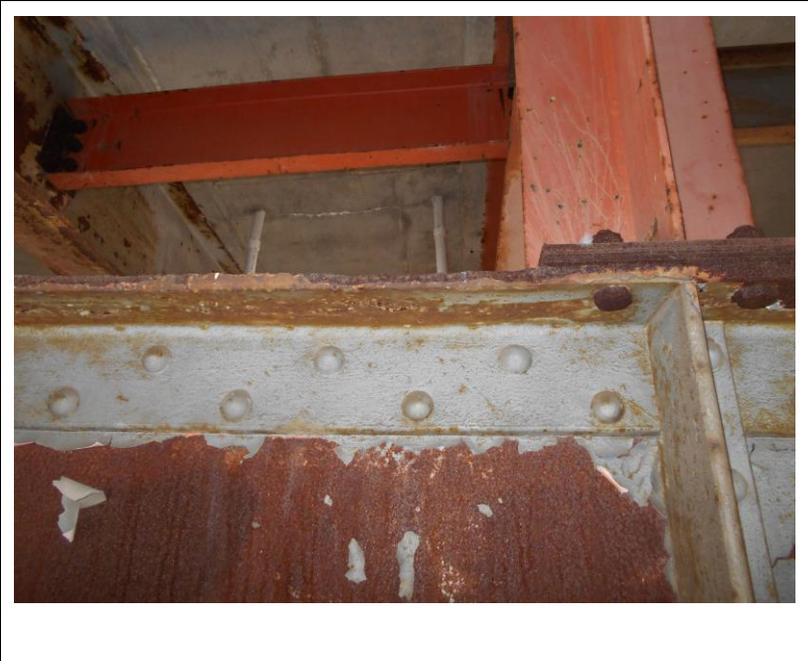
Bridge No. 00571A, Deterioration of Vertical Gusset Plate due to Rust Accumulation on Horizontal Gusset Plate.
